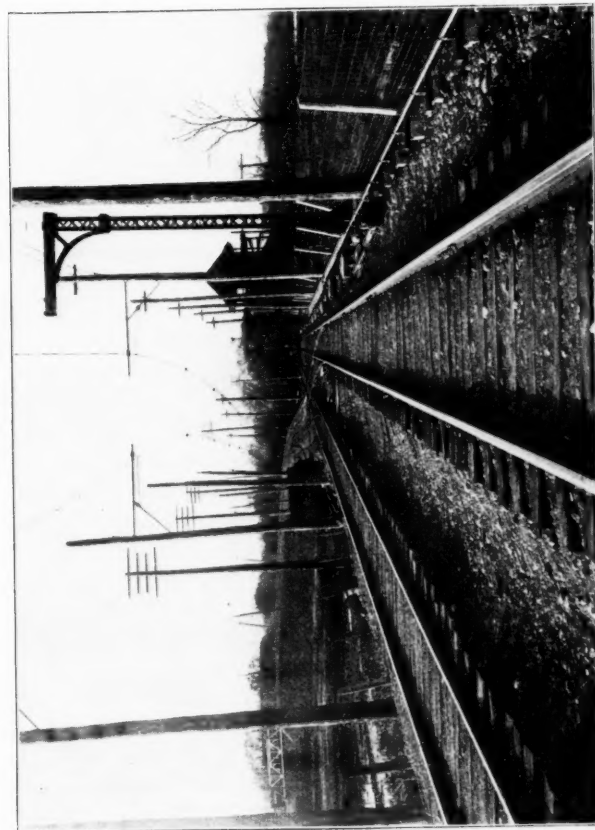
CONNECTING TRACKS BETWEEN STEAM AND ELECTRIC SECTION OF THE WEST SHORE RAILROAD
